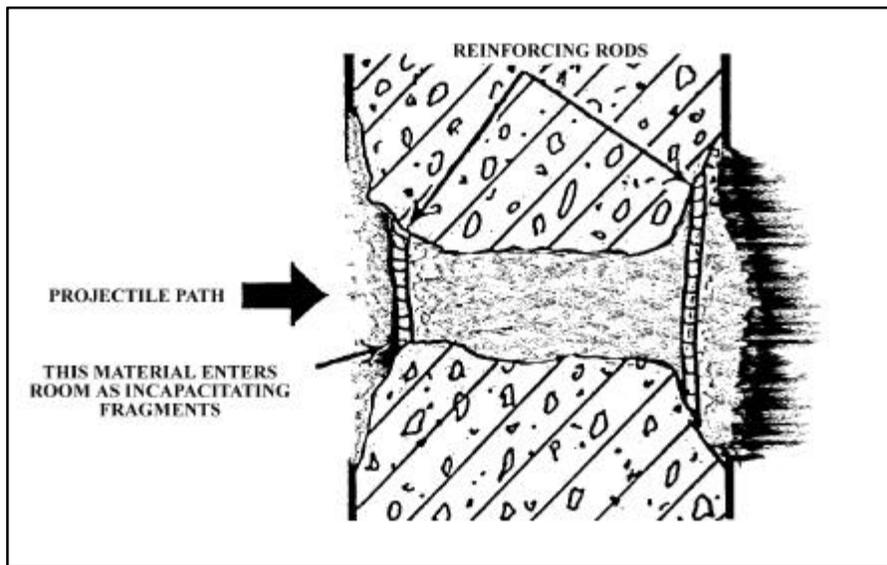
Tank HEAT Round Effects on Reinforced Concrete Walls
